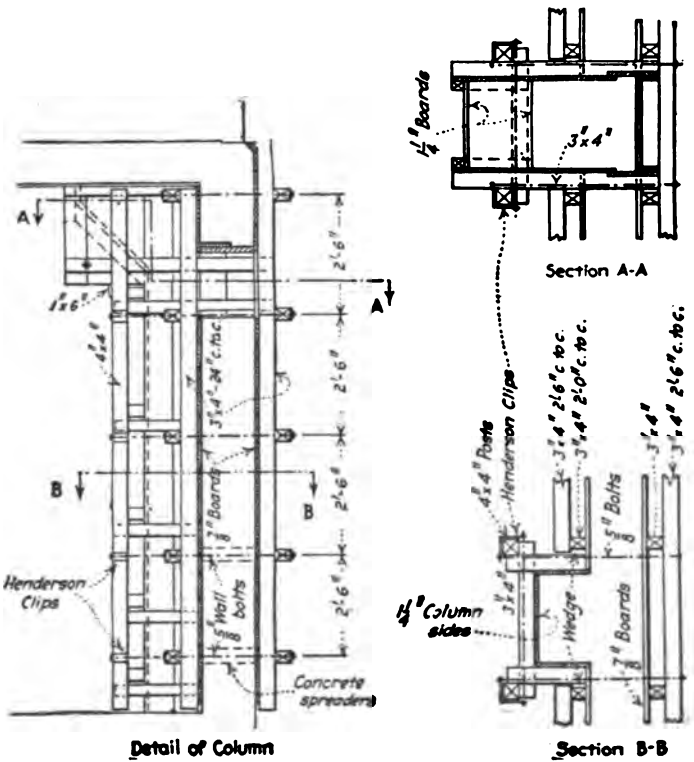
Wall column forms employed in Morrill building, Portland, Me.
